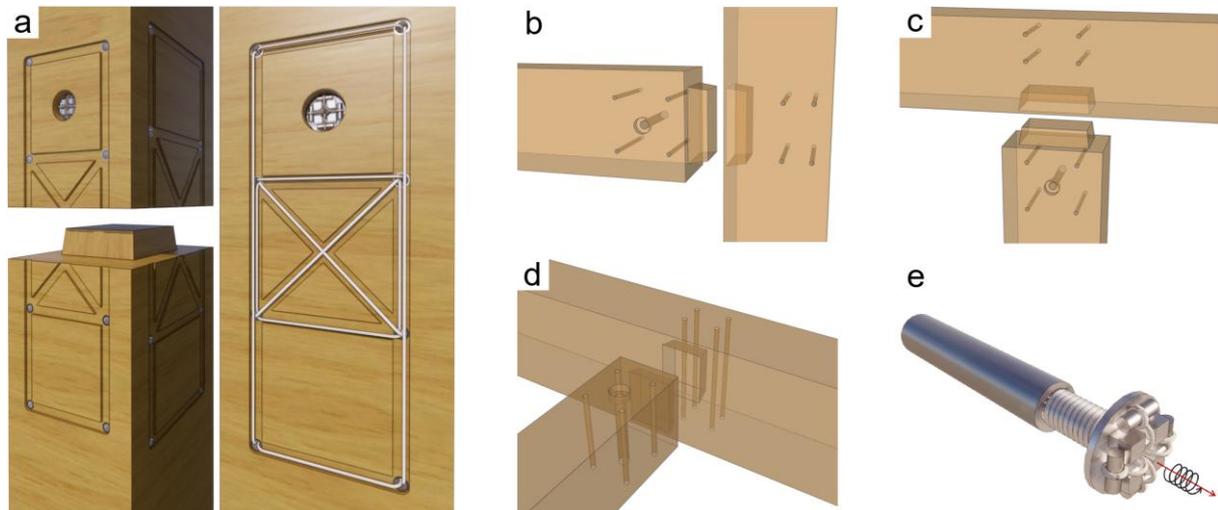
(a) the proposed lashing-mortise-tenon joint (post-to-post); (b) beam-to-post joint; (c) post-to-beam joint; (d) joist-to-beam joint; (e) prestressing device.
